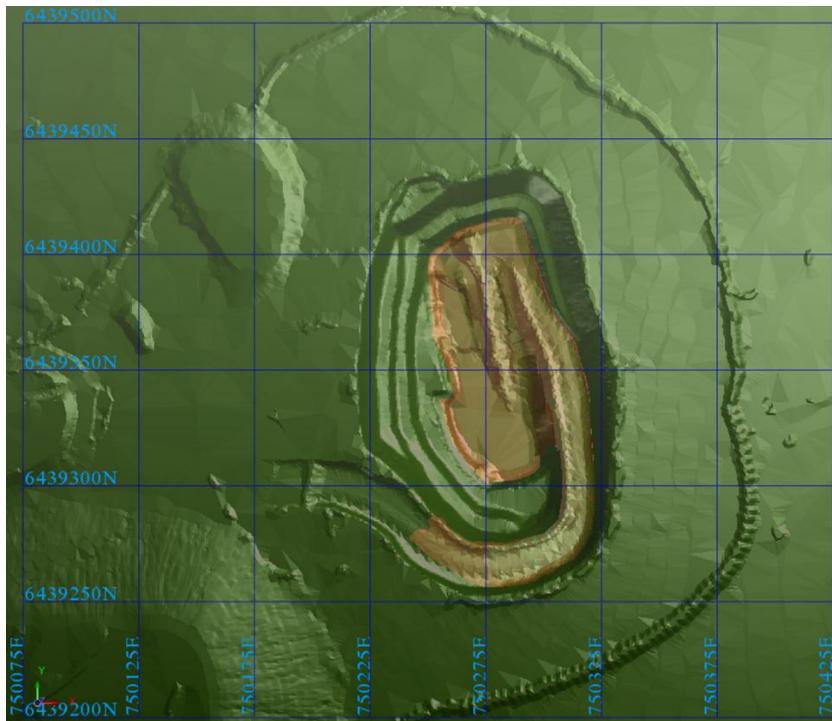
Tasman Open Pit plan view showing existing pit lidar surveyed shell in green and proposed red extensions
